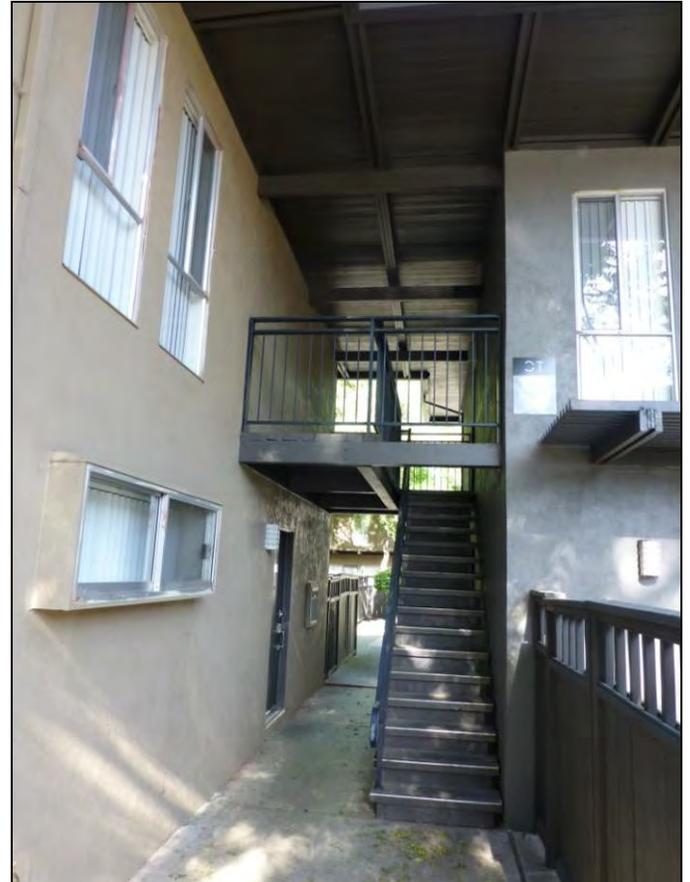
First story enclosed patios at right, second story balcony at left, camera facing northeast, April 18, 2014.
